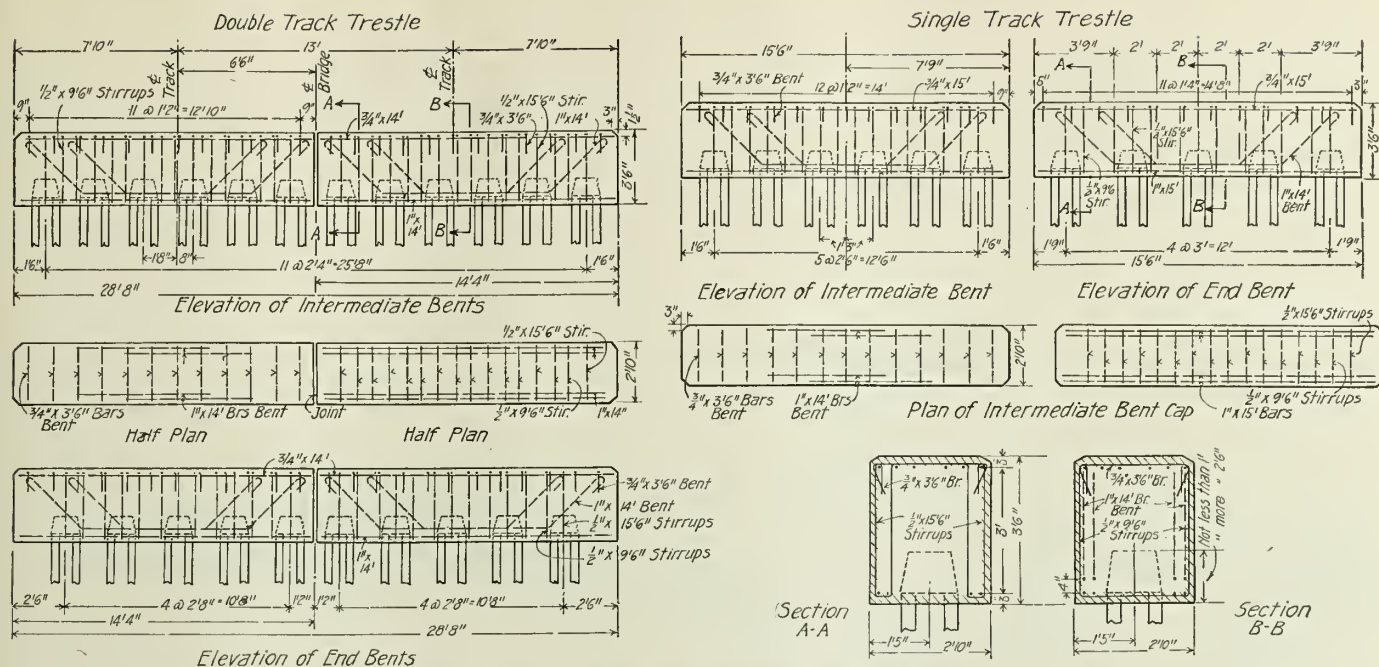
General Plans of Standard Reinforced Concrete Pile Trestle Bents, C., M. & St. P. Ry.
